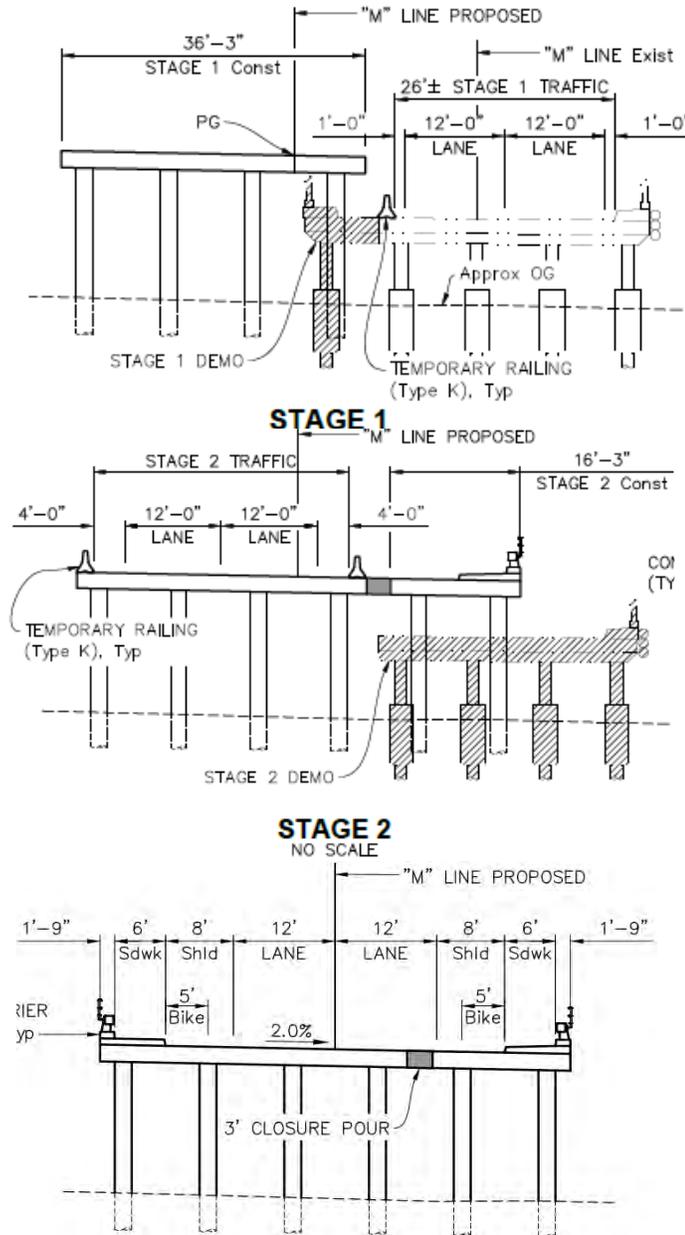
Alternative 2 CIP/PS Slab Bridge typical section and bridge profile
